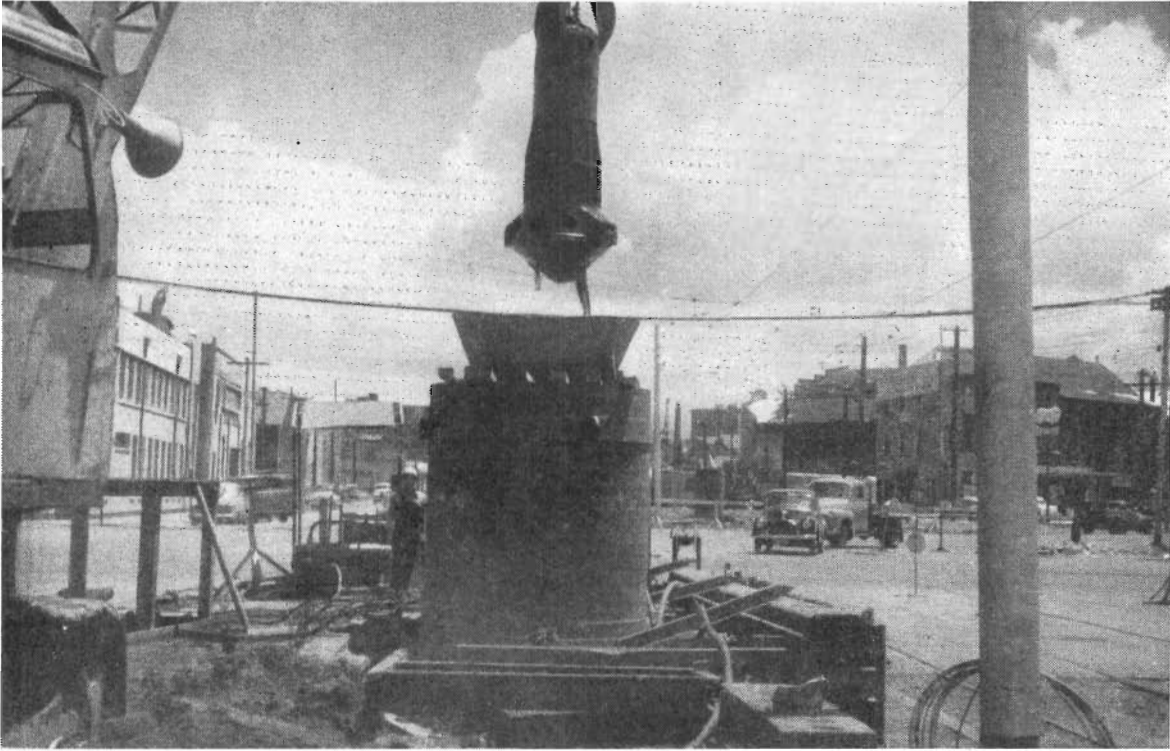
King-street Bridge Project—Cylinder and Benoto Bucket.
